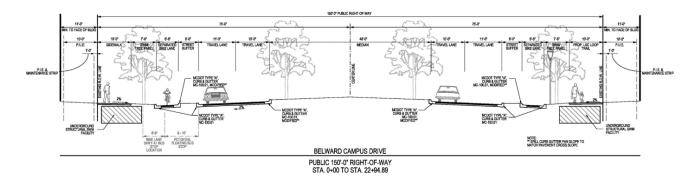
Proposed Road Cross-Section for Belward Campus Drive
